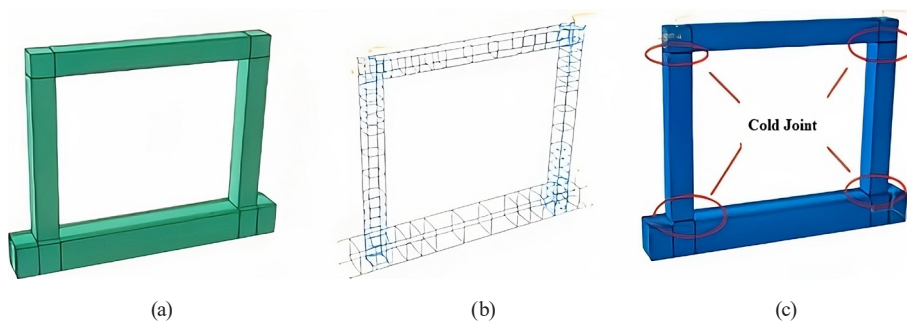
Numerical model; (a) Geometry of the concrete section in the monolithic concrete model; (b) Geometry of rebars and stirrups; (c) Geometry of the CJ model
